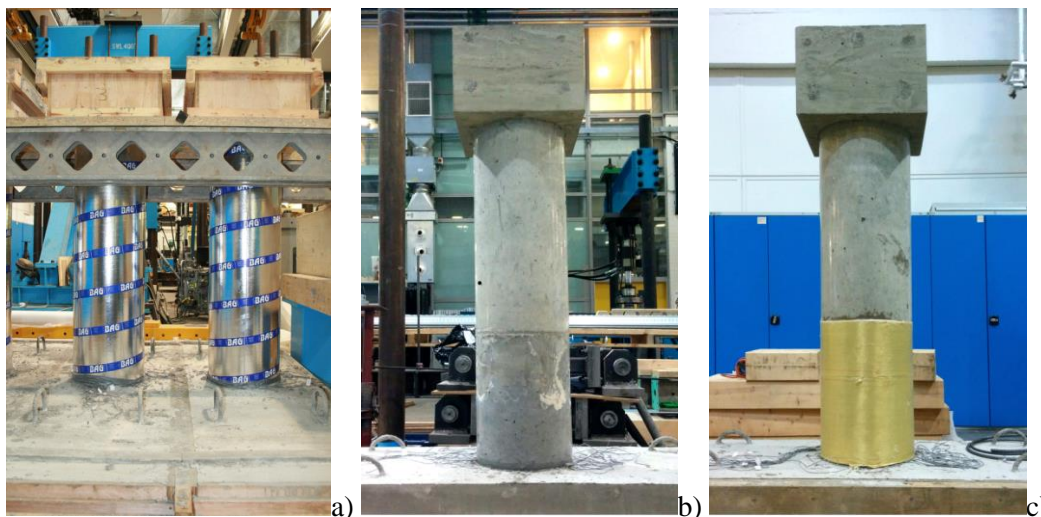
Large-scale specimens a) Formwork, b) RuC column c) AFRP CRuC column
